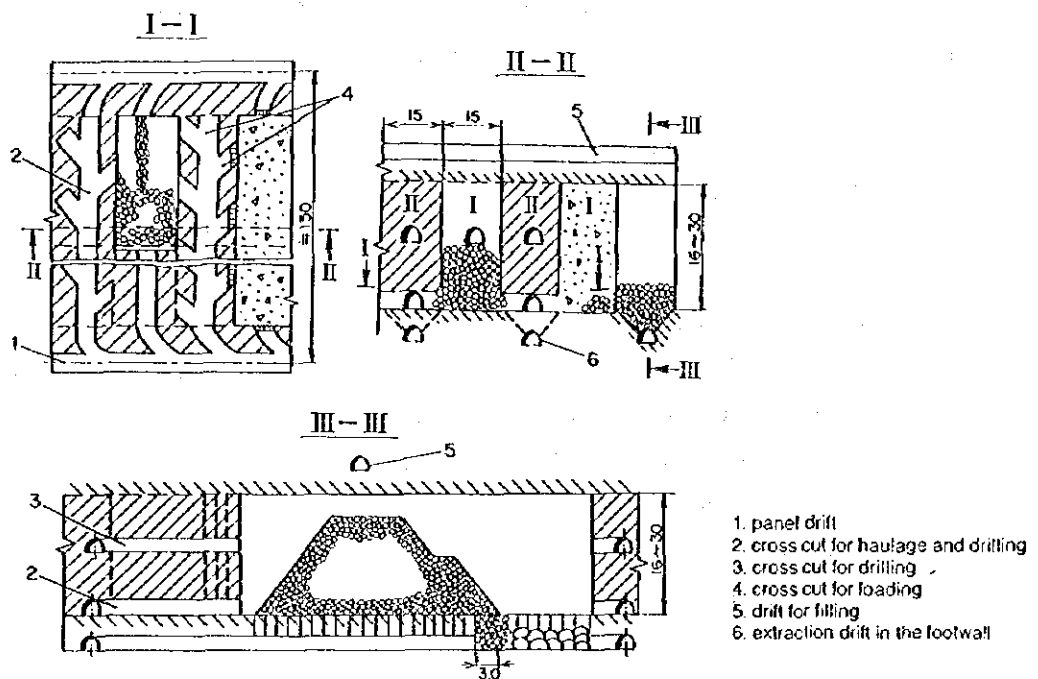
Room and Pillar Mining Method (stopping height higher than 16~18m)
